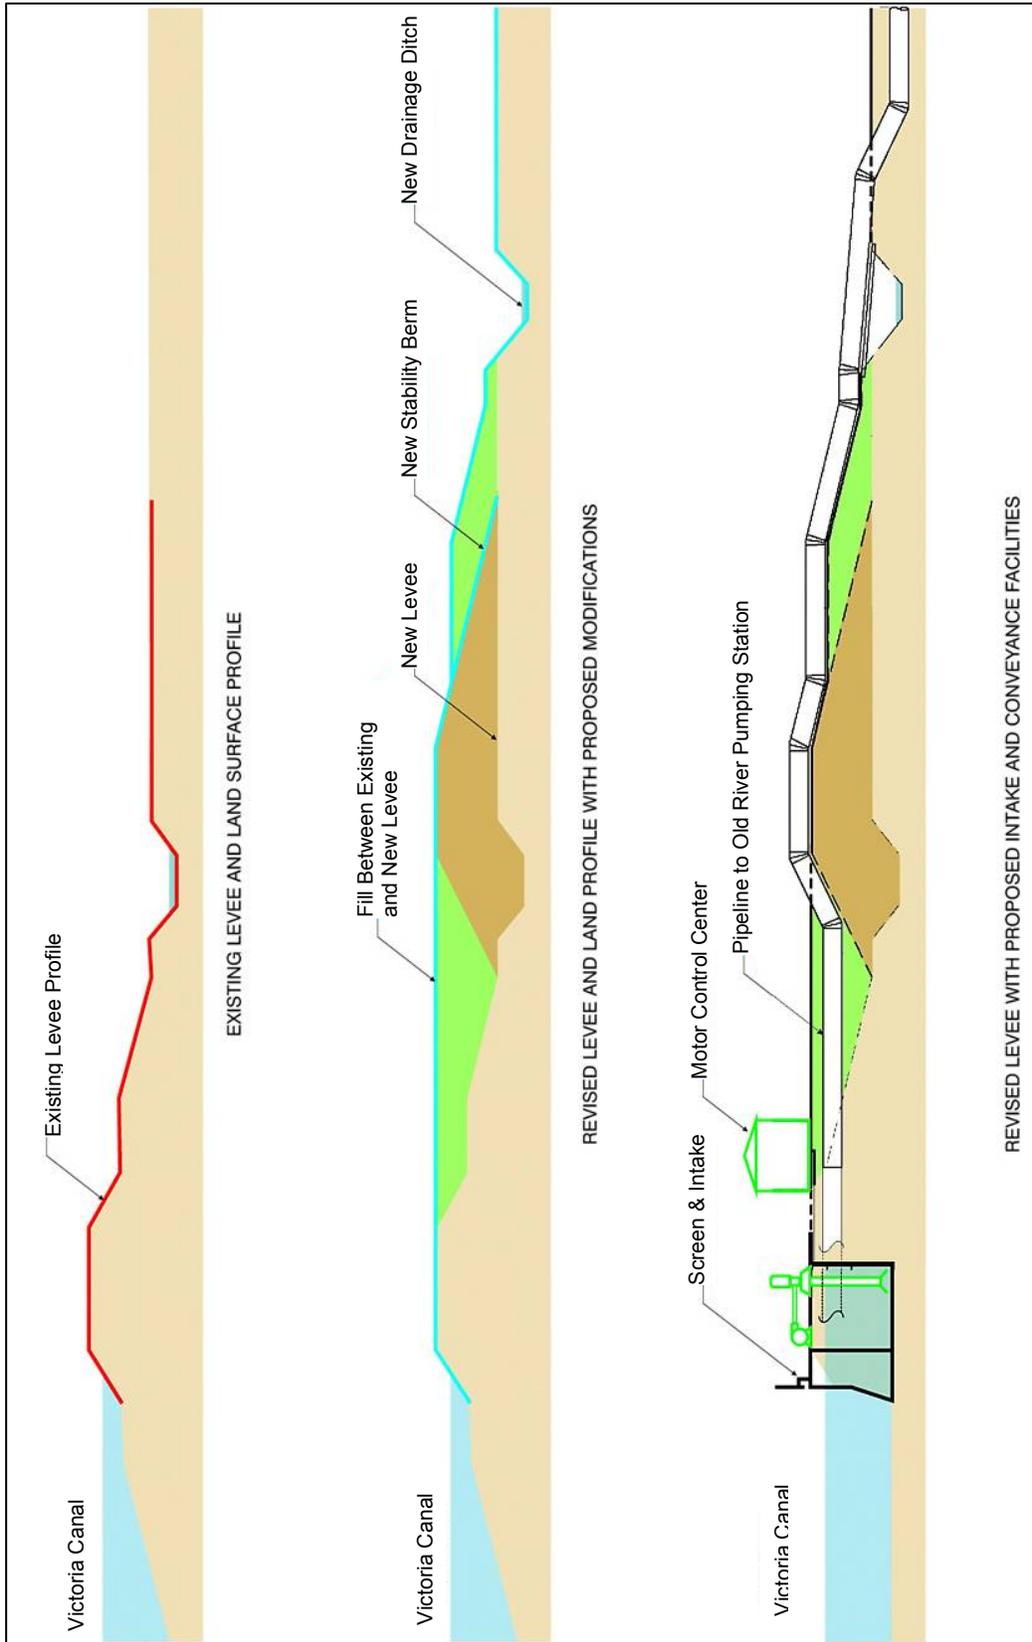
Plan 1 – Conceptual Cross-Sections of Proposed Levee Modifications and Proposed Intake and Conveyance Facilities
